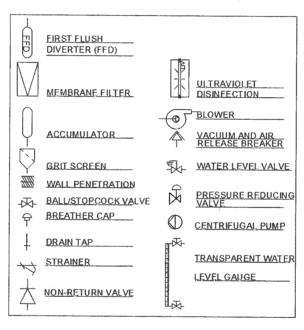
LEGEND USED FOR A TYPICAL RAINWATER HARVESTING INSTALLATION
